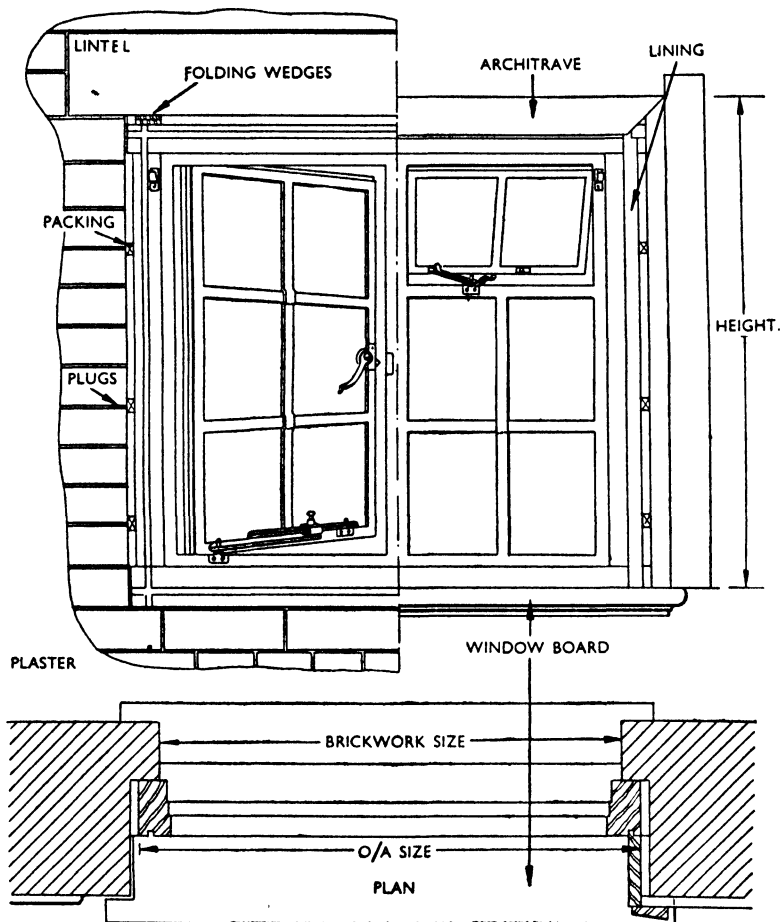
Method of fixing casement window in existing brickwork opening. (Left) Folding wedges at head and plugs in wall for frame and linings. Note how the window board is fitted round the brickwork. (Right) How to fit the architrave.
